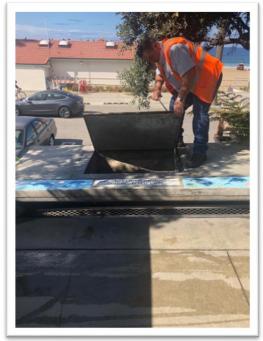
Strand Stormwater Sump #5 at Manhattan Beach Blvd.
